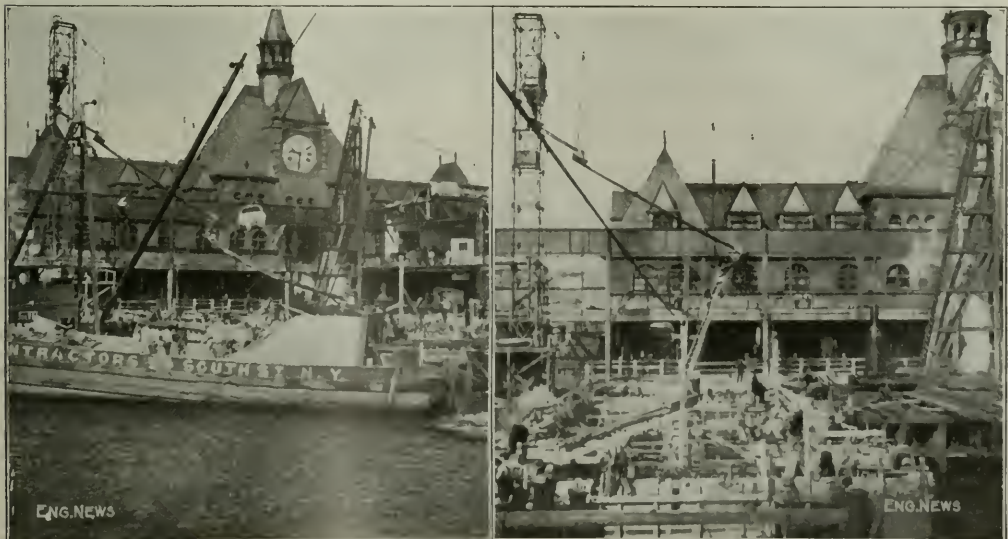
CONTRACTOR'S PLANT ON FERRY HOUSE CONSTRUCTION
